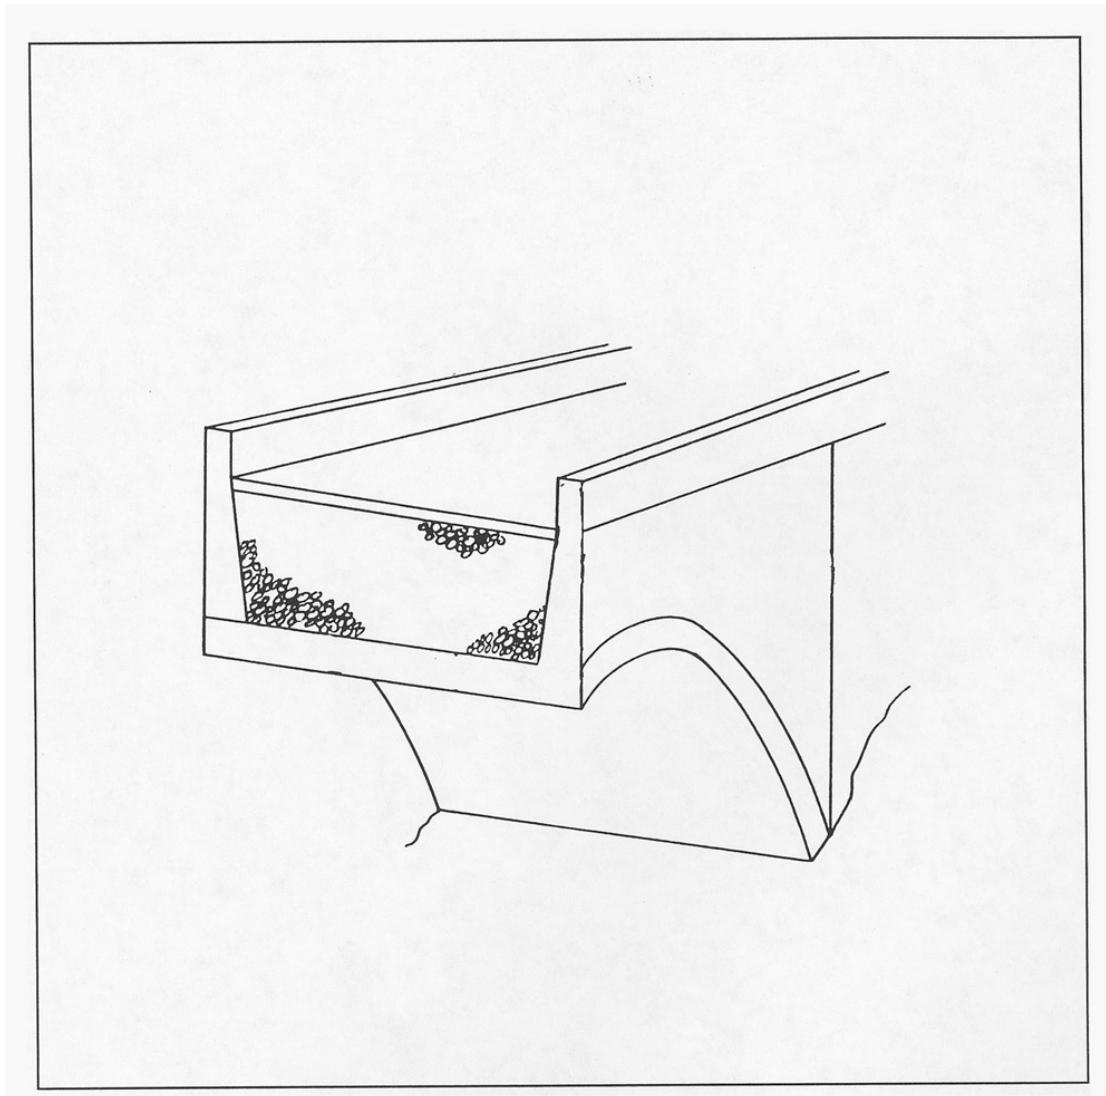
Section of closed spandrel concrete arch (Adapted from: FHWA 1991: 9-17).
